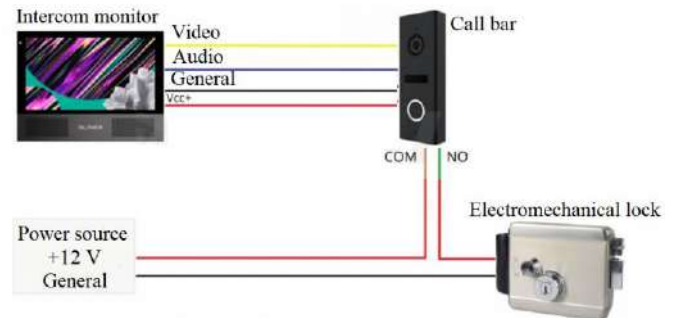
Connecting electromechanical lock to intercom for remote door opening using power supply unit
